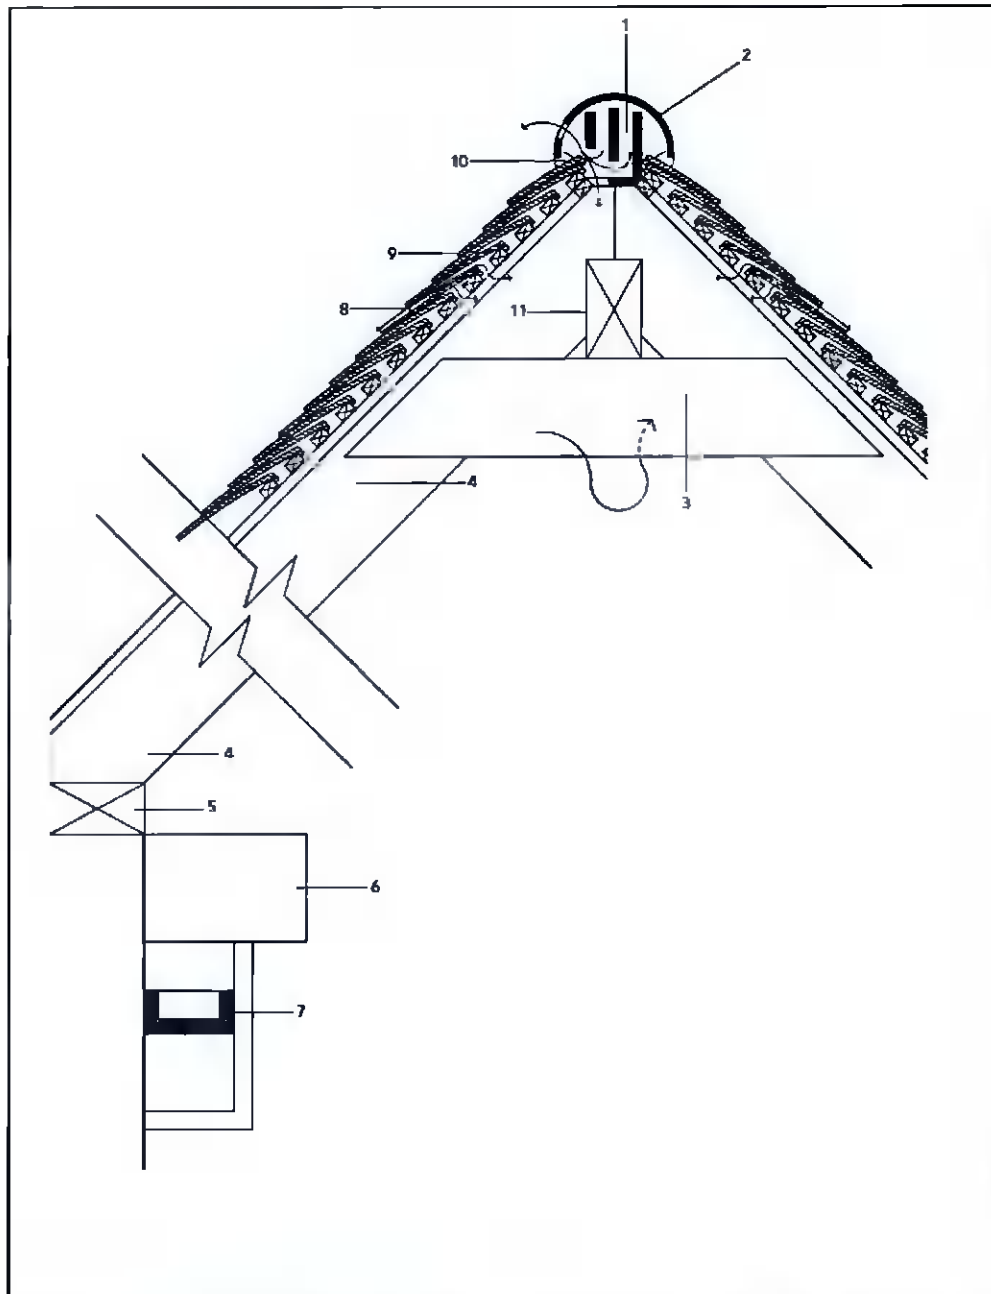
Figure XX. Drawing showing detailed design of roof space for crevice dwelling bats in an uninsulated space.
